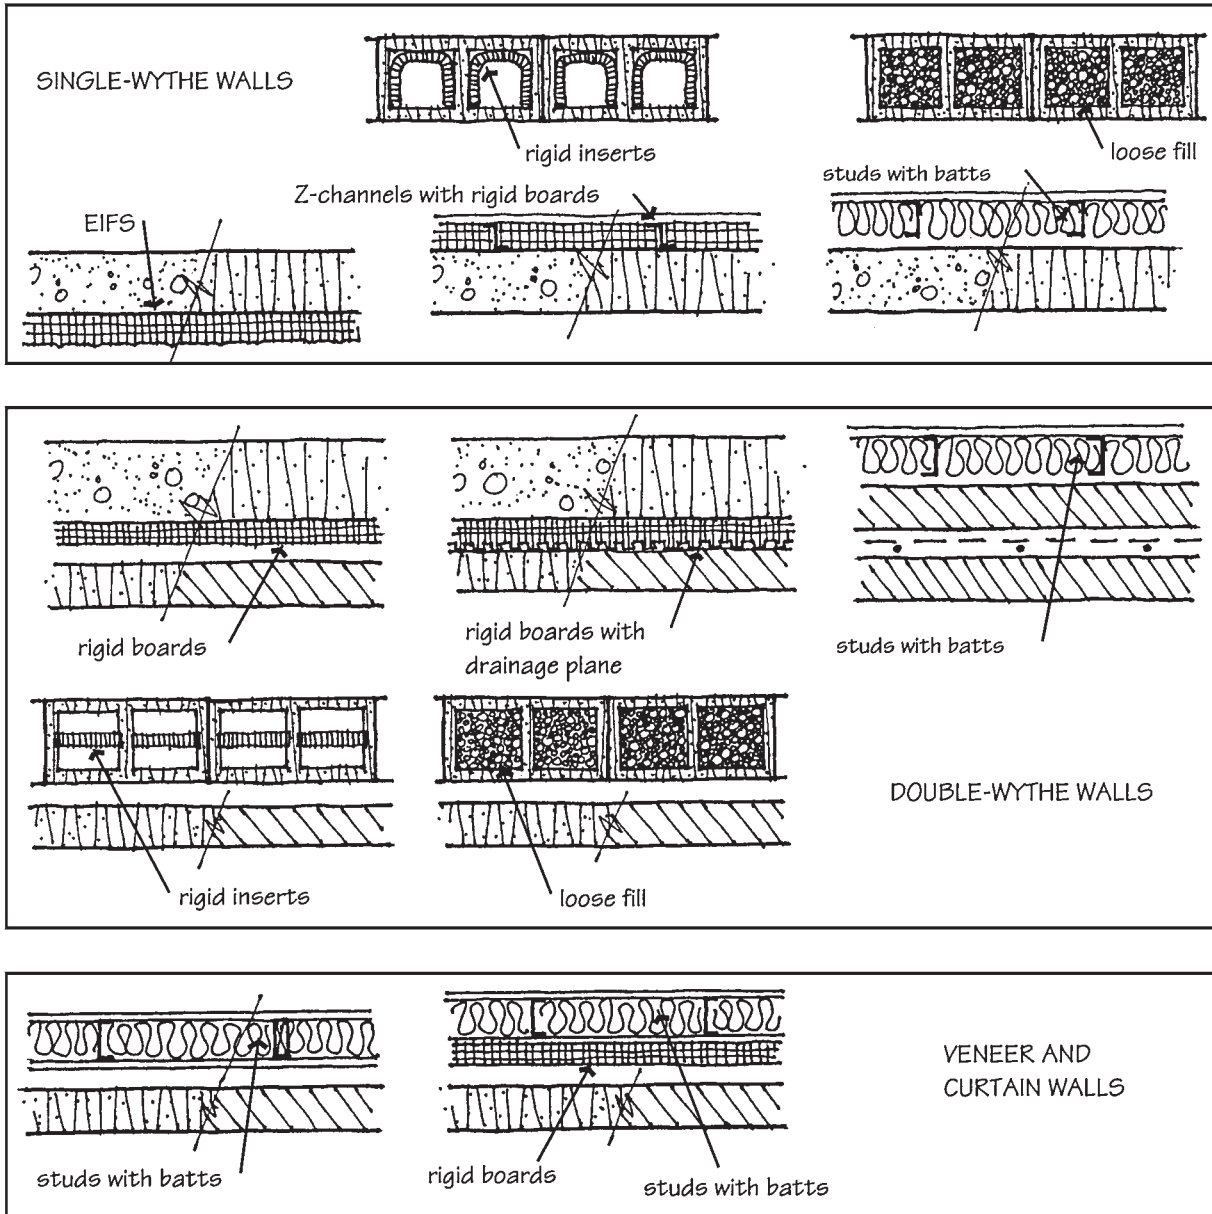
Methods of insulating concrete and masonry walls. (Adapted from Beall and Jaffe, *Concrete and Masonry Databook*, McGraw-Hill, New York, 2003.)
